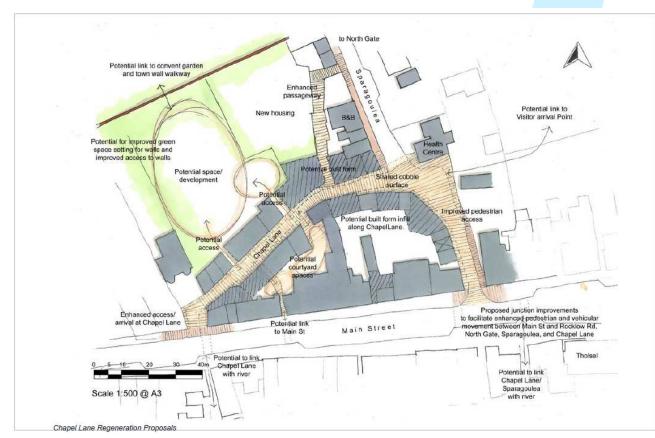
Plan for the regeneration of Chapel Lane from Public Realm Plan
